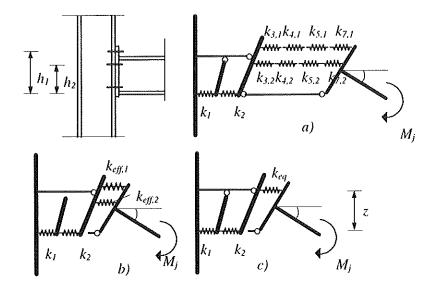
Spring model for a beam-to-column end plated joint with two bolt rows in tension.
